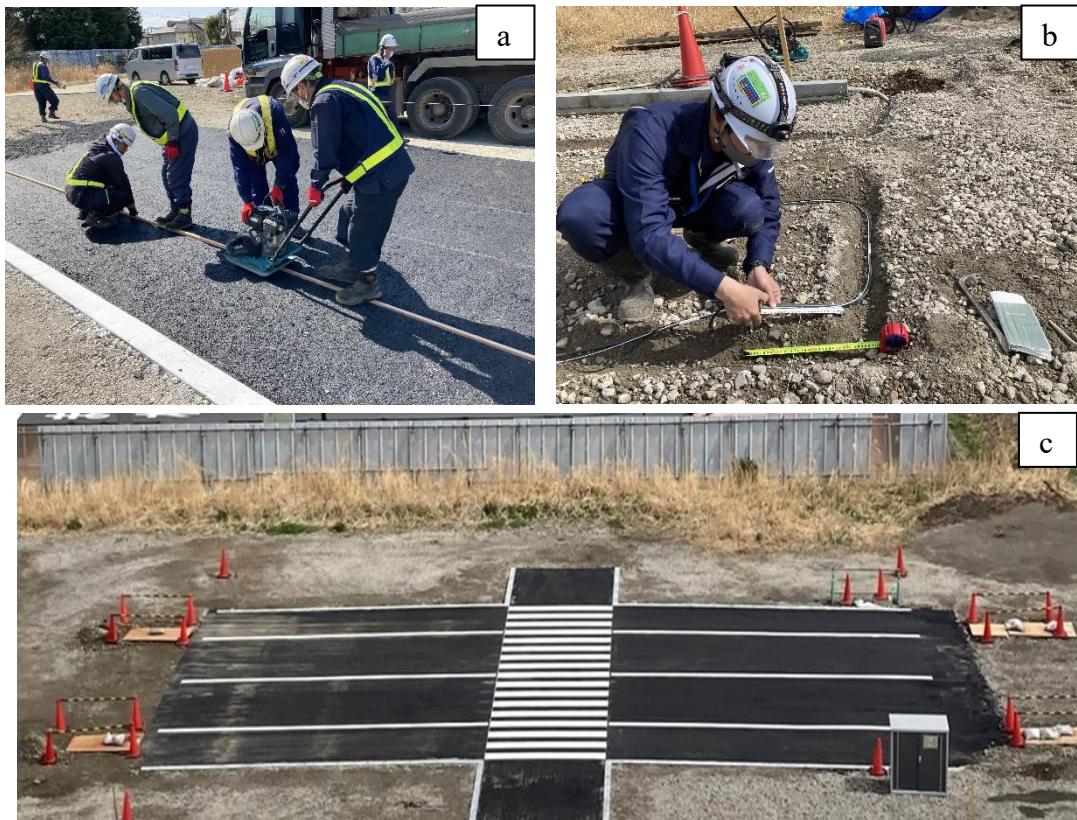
Road pavement overview: (a) View of construction, (b) Installation of optical fiber, (c) At the time of completion of construction
